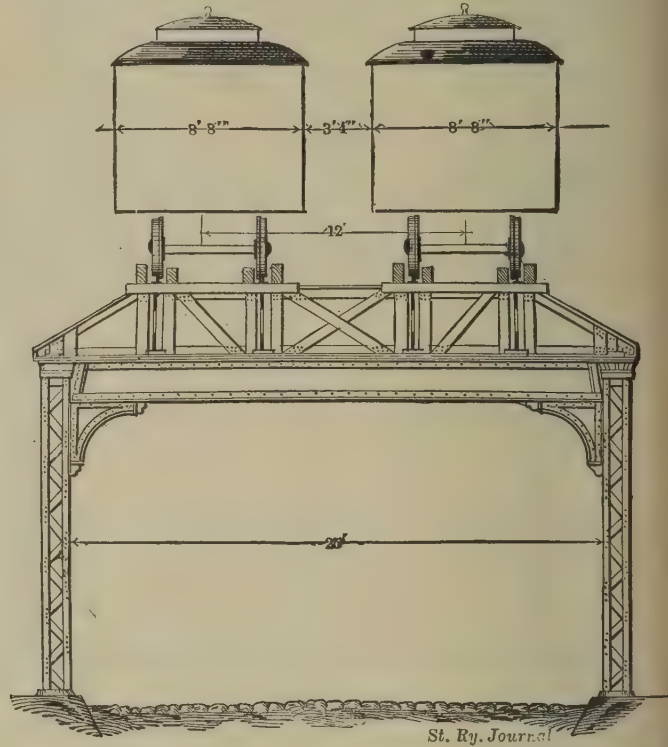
REINFORCED TRANSVERSE GIRDER.
